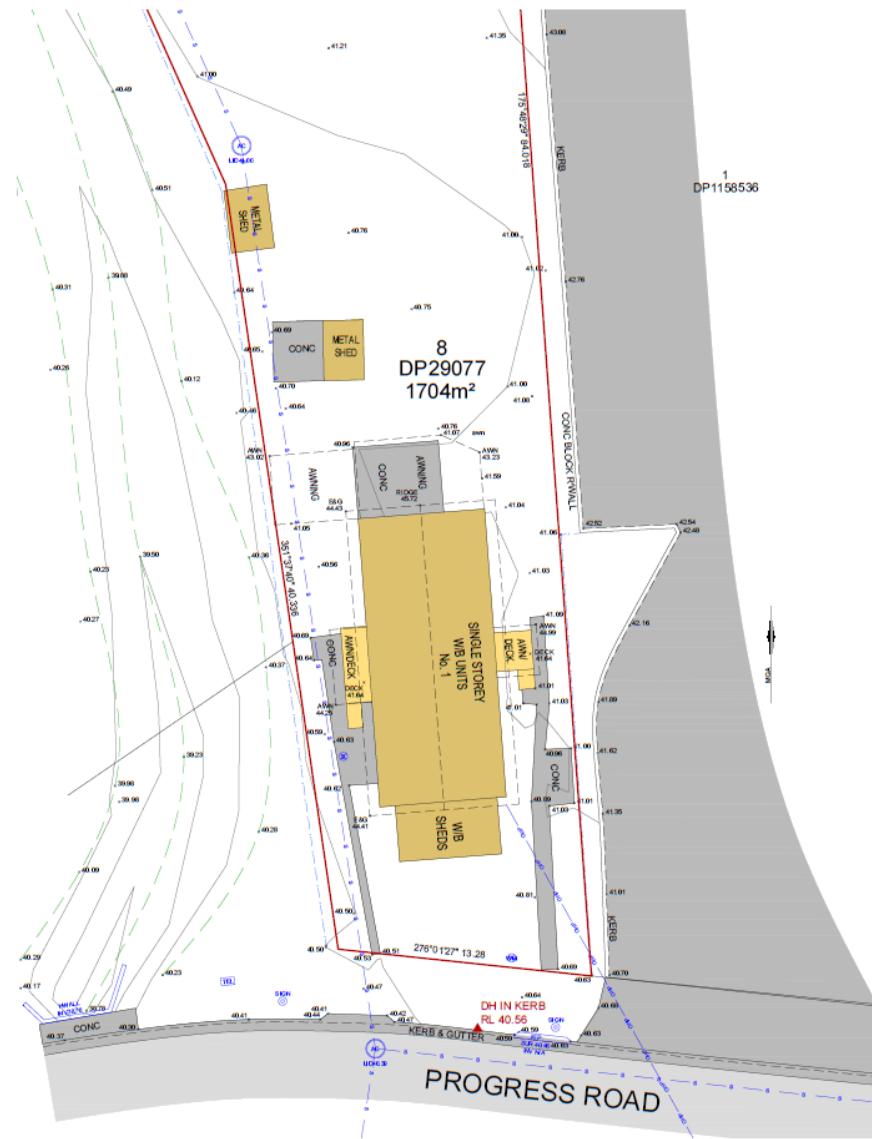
Existing Site Layout and Access, 1 Progress Rd, Mt Hutton
